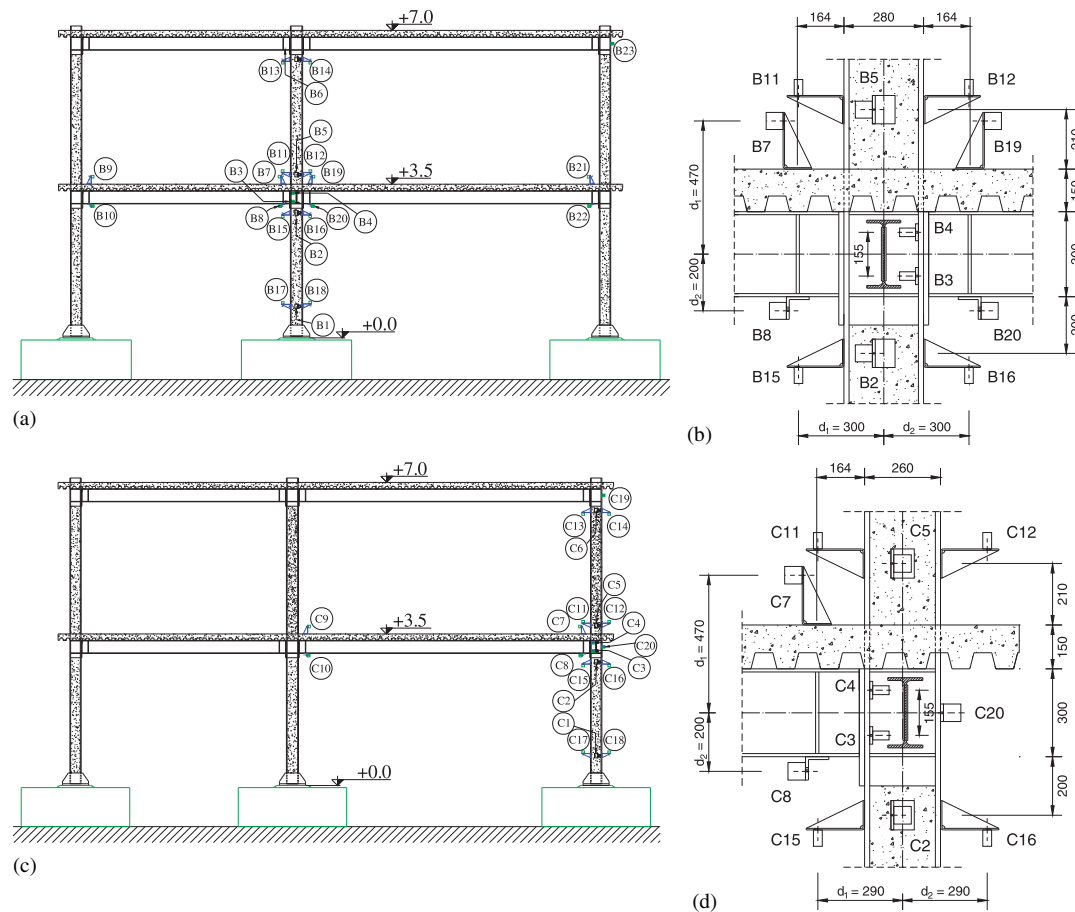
Local configurations of accelerometers: (a) interior members; (b) interior beam-to-column joints; (c) exterior members; and (d) exterior beam-to-column joints.
